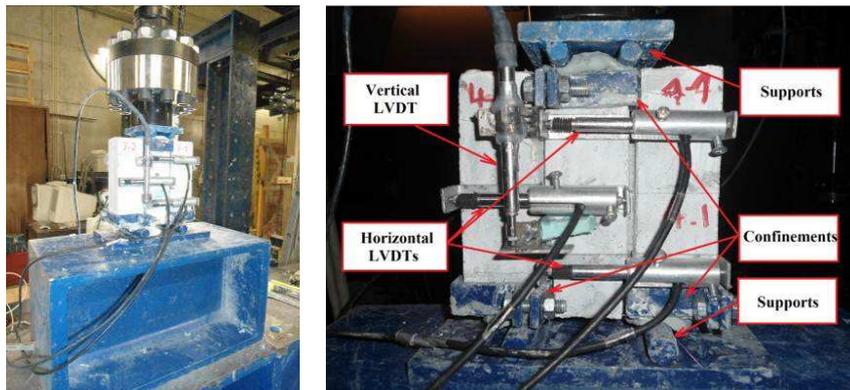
(left) Test setup (right) Location of LVDTs, supports and confinements
